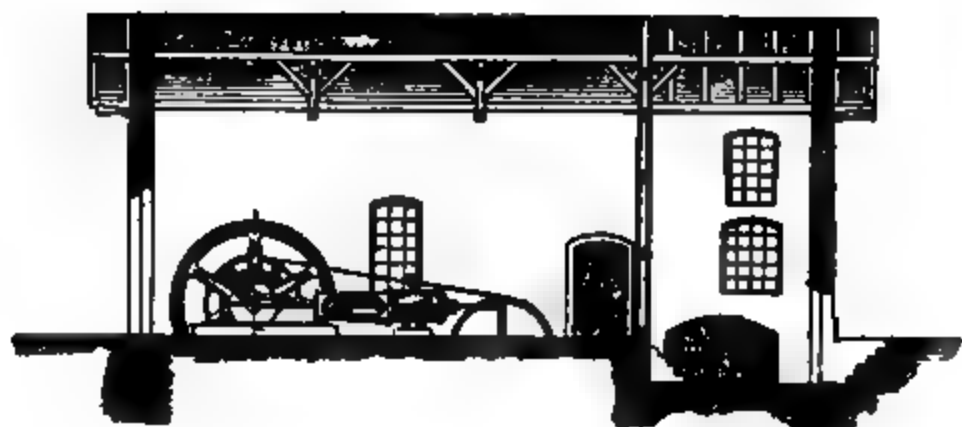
OTTO AERIAL ROPEWAY. SECTIONS OF ANGLE AND POWER STATION.
